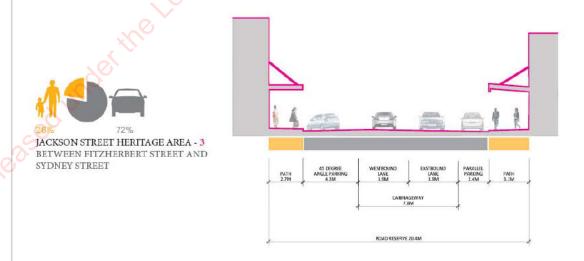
Existing Jackson Street cross section (Heritage retail zone)
